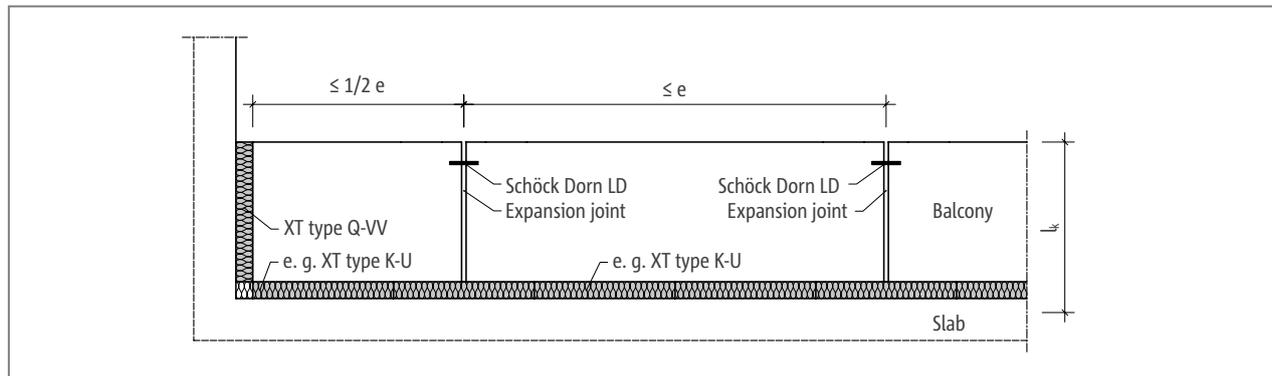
Schöck Isokorb® XT type K-U: Expansion joint configuration
